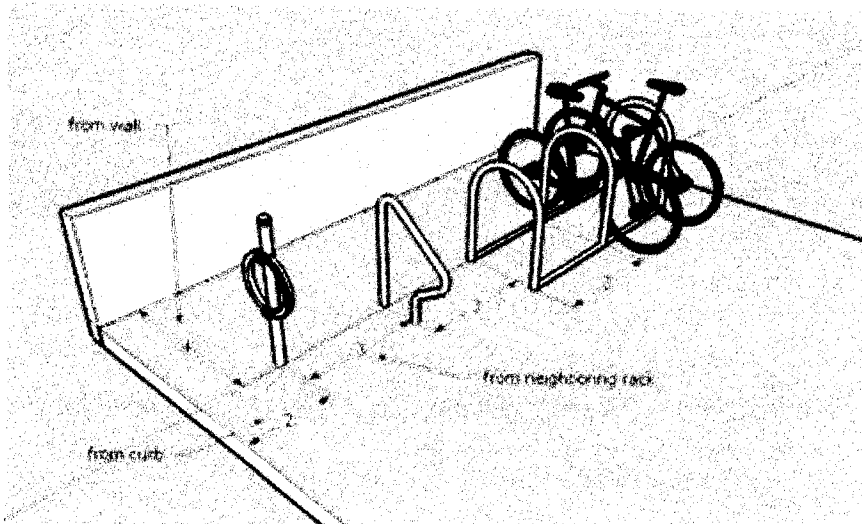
Exhibit C Off-Street Bicycle Parking Tables 14-8.6-3, 14-8.6-4
